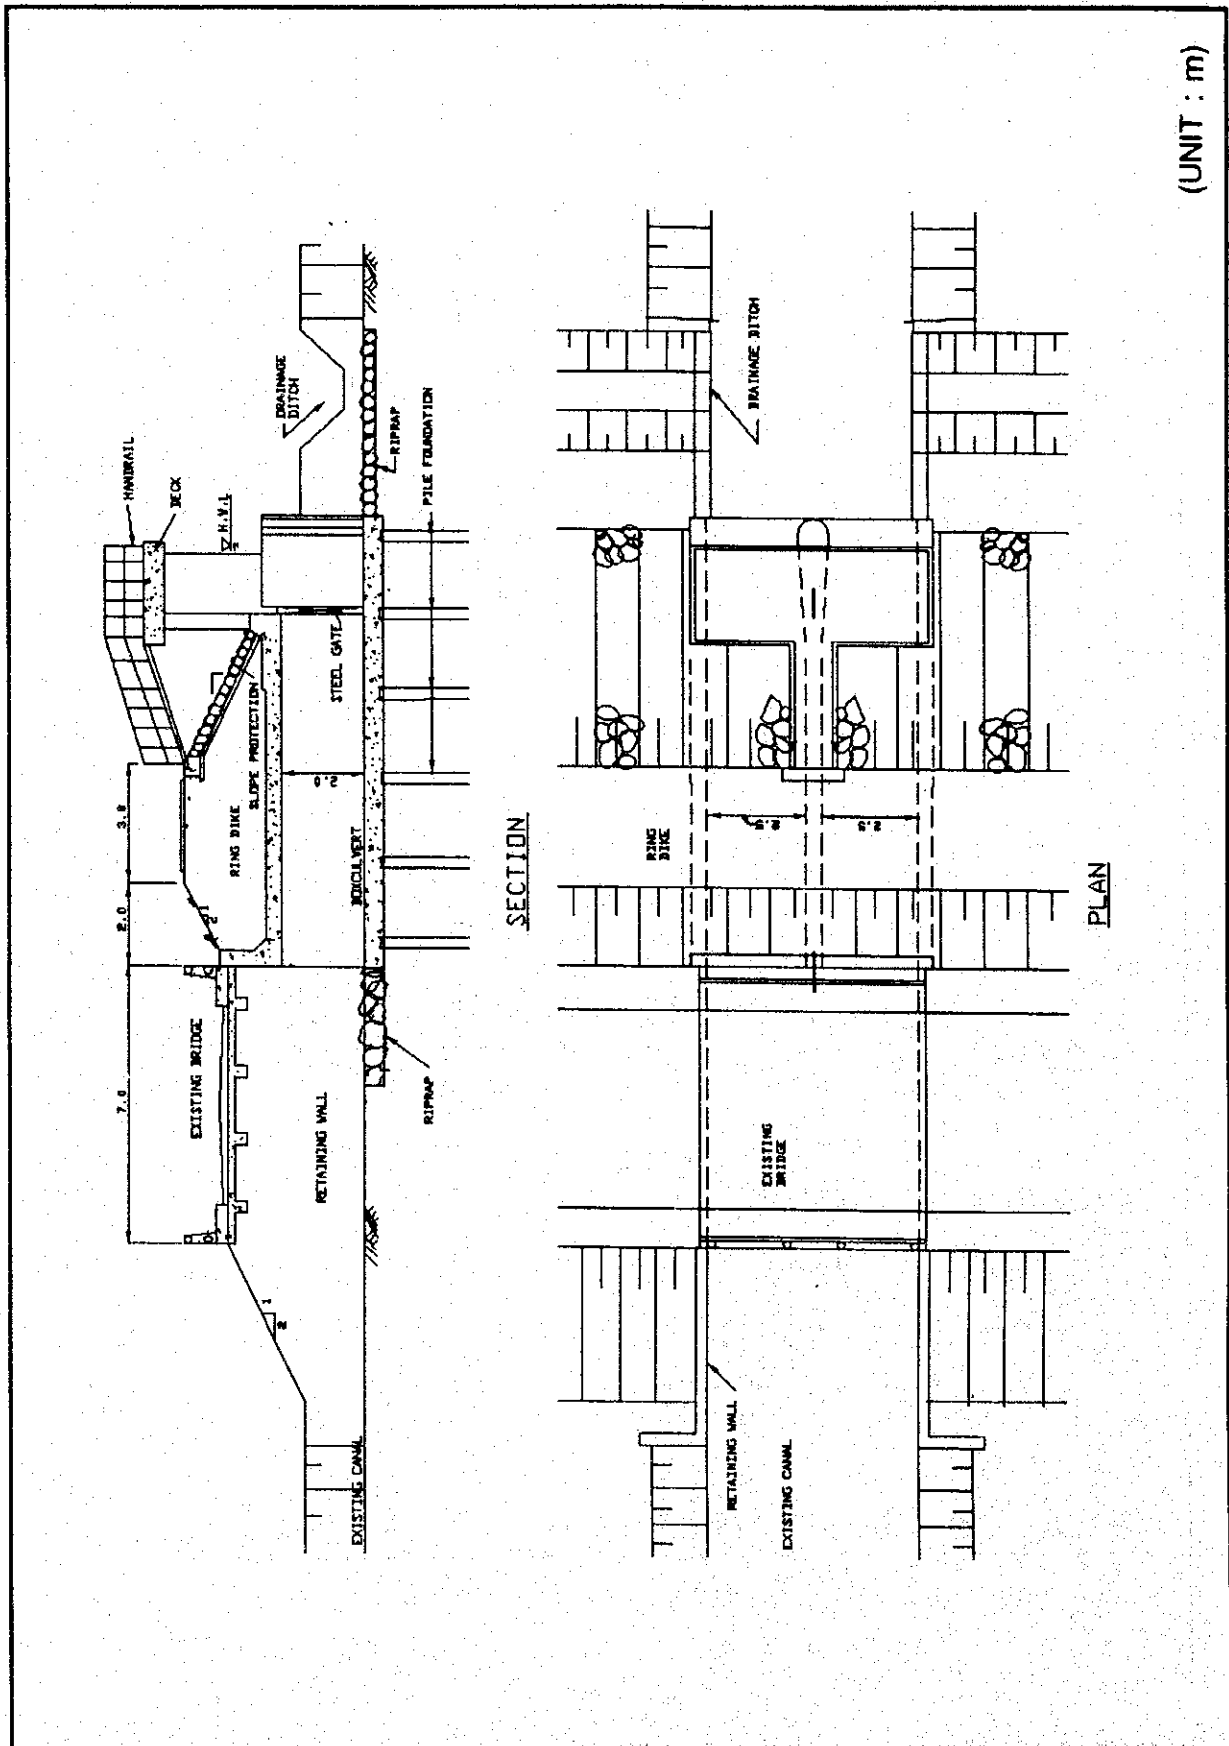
PROPOSED CROSS SECTIONS
